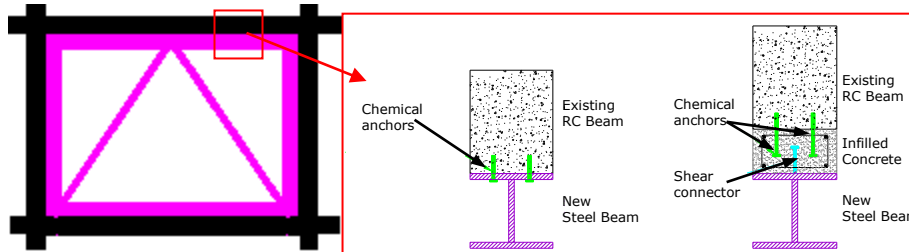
"Continuously" connected to the RC frame (infilled steel braced frame connections) - in-plane of RC frame - the RC frame - drilled bolts / chemical anchors
